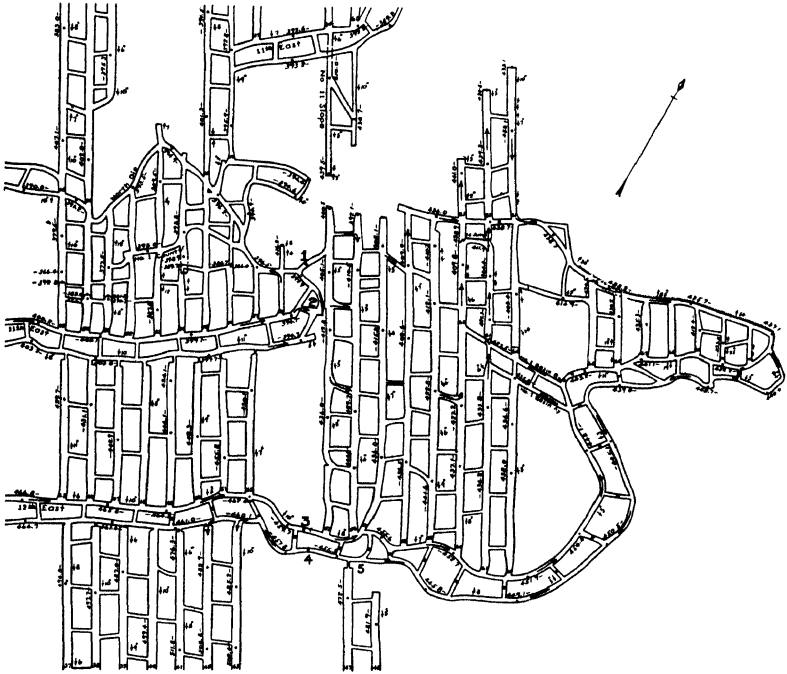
PLAN SHOWING LOCATION OF FIRE AND MINE WORKINGS INVOLVED, NOTTINGHAM No. 15 COLLIERY.
